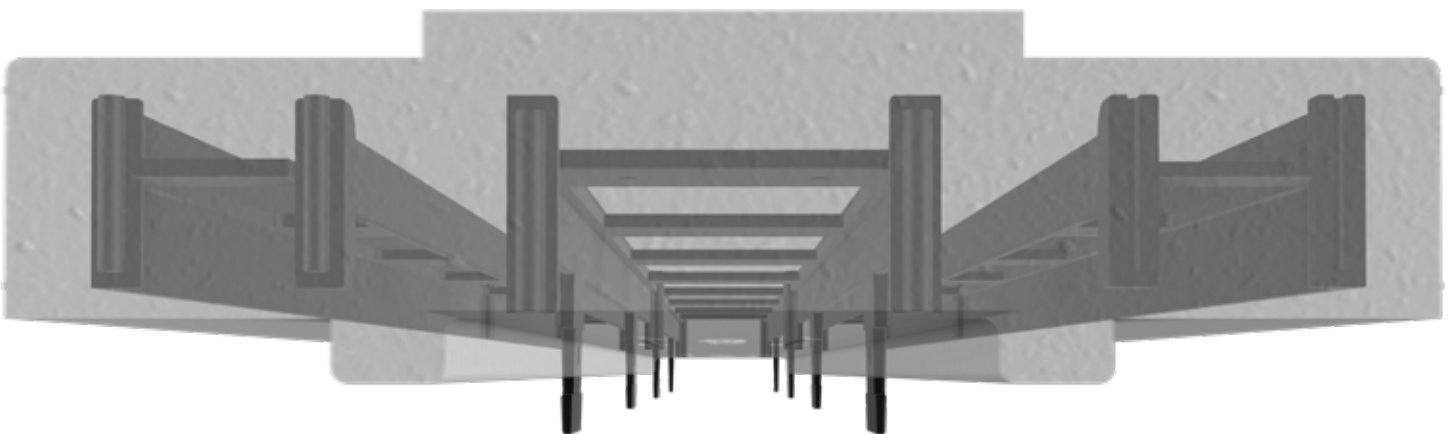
BuildBuck assembly showing embedded webs with "T" concrete anchors and foam insulation.
